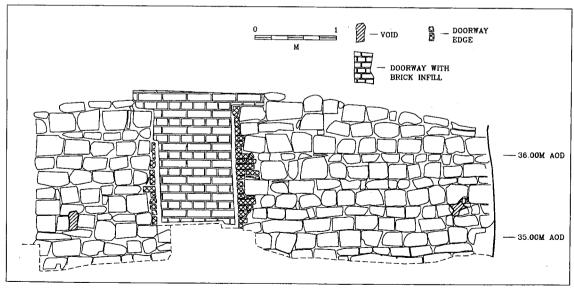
100 Pilgrim Street: West External Stone Wall.
